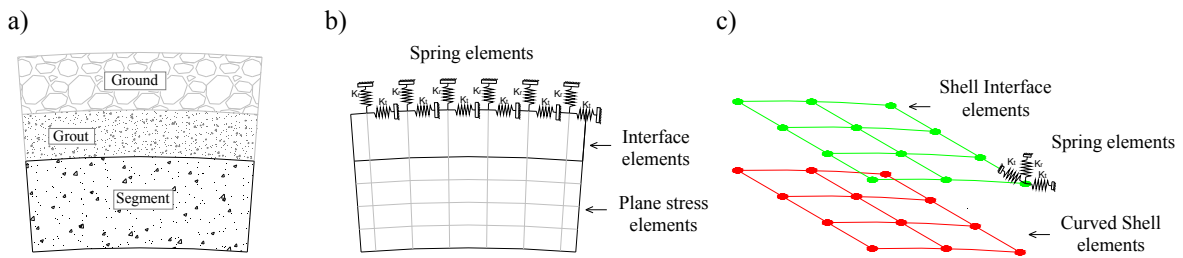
Tunnel cross section scheme (a). Plane stress modeling (b) and shell elements modeling (c).
